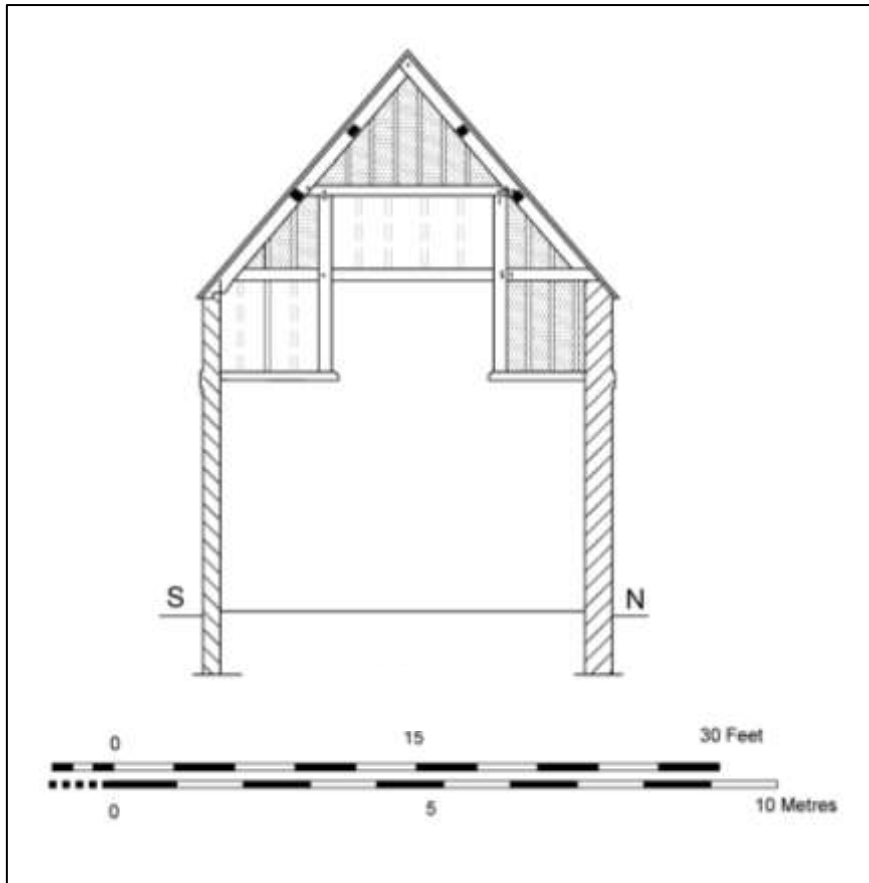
Cross-section through barn, showing Truss 4 (T4 above).
